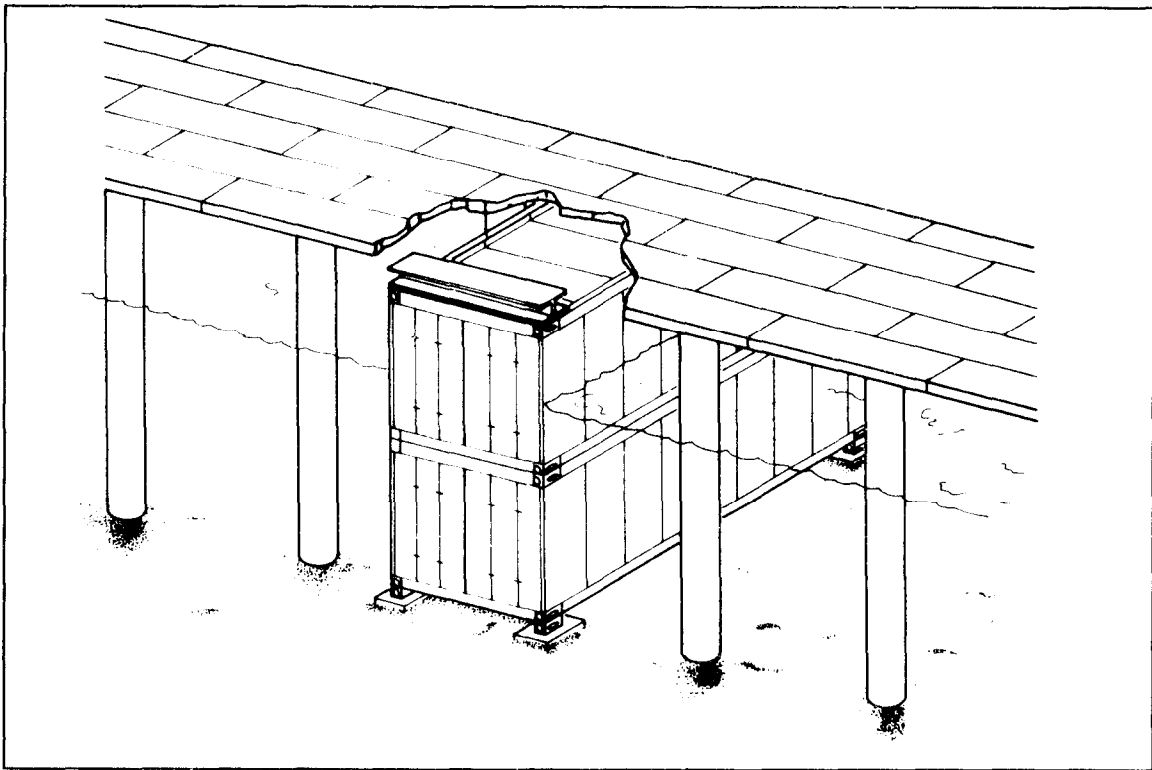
Container Used as Pile Replacement (Support Structure)
